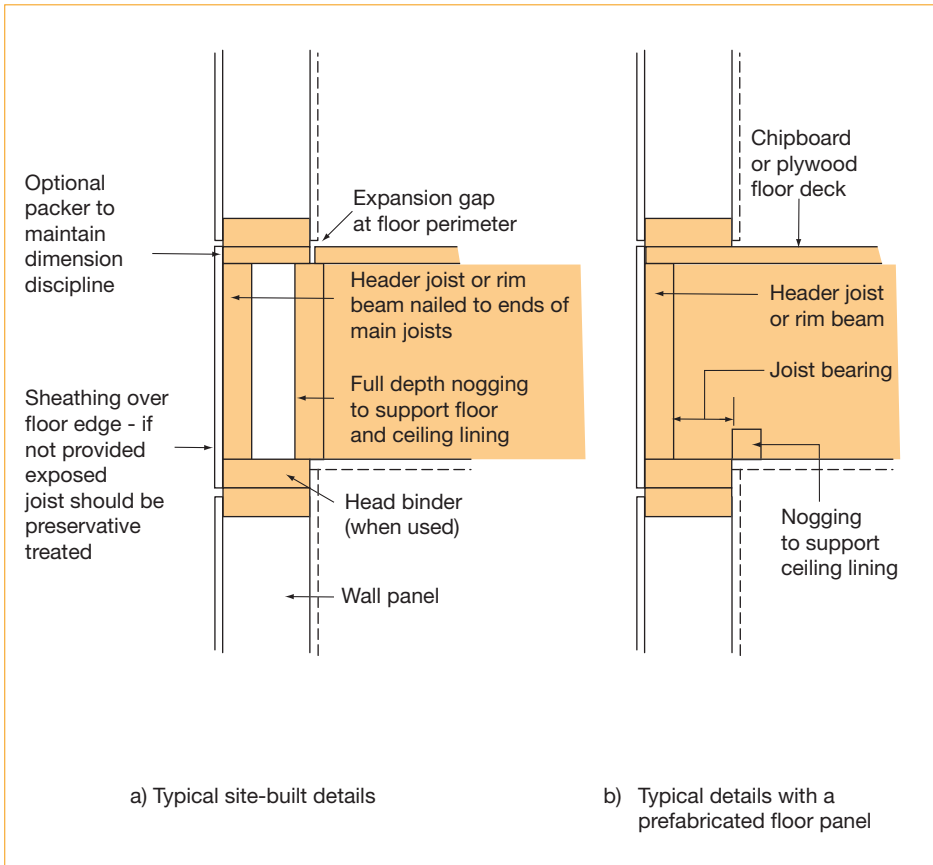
Typical intermediate floor/external timber frame wall junction details: joists at right angles to wall
